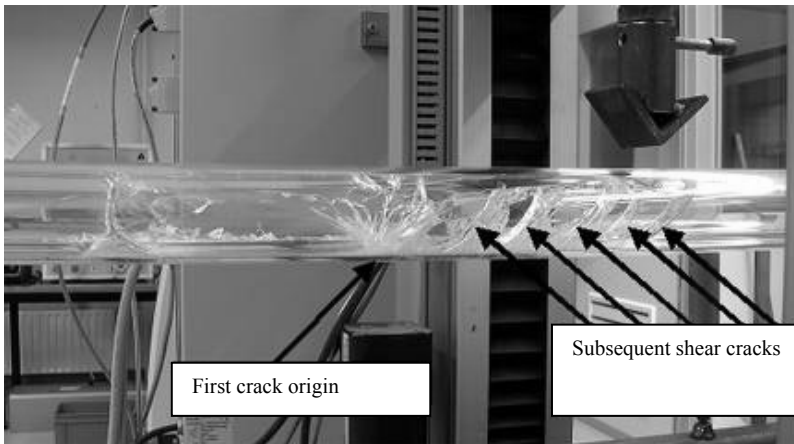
Fracture pattern in bending loaded TFS prototype, after initial failure.
